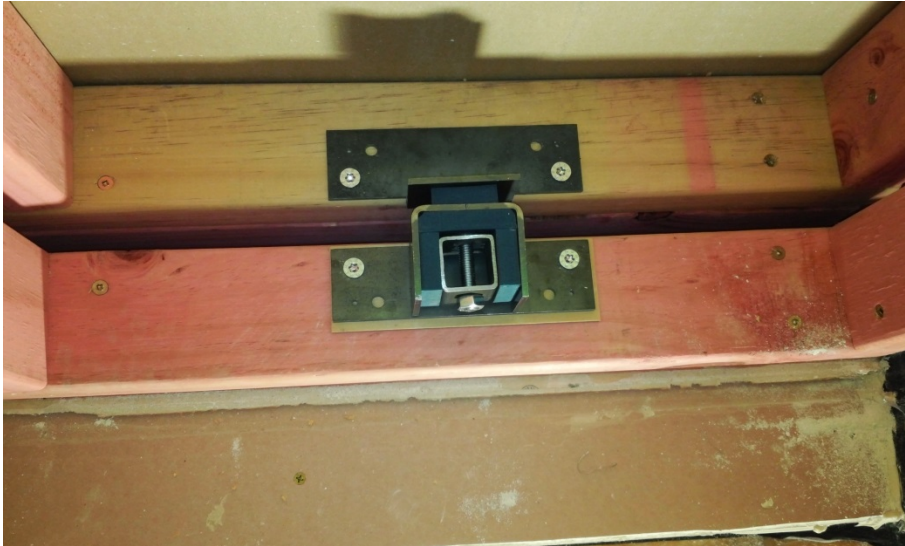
A connector fixed to the bottom plate of the test wall. The 160mm screws penetrate into the joists.
